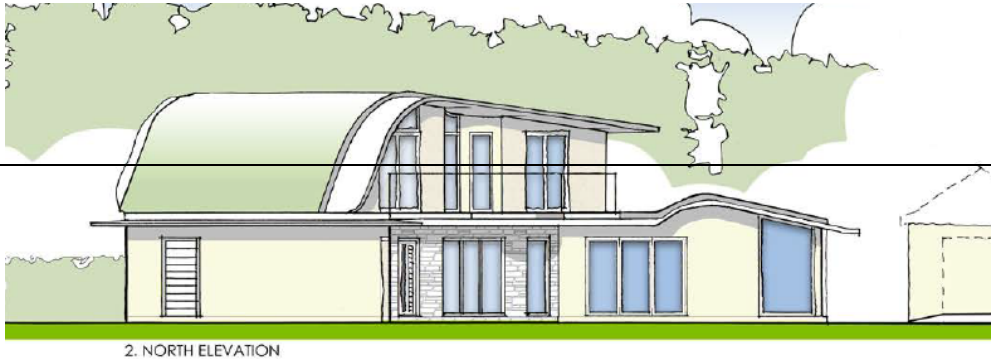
North Elevation of Proposed Dwelling (relative to existing garage)
